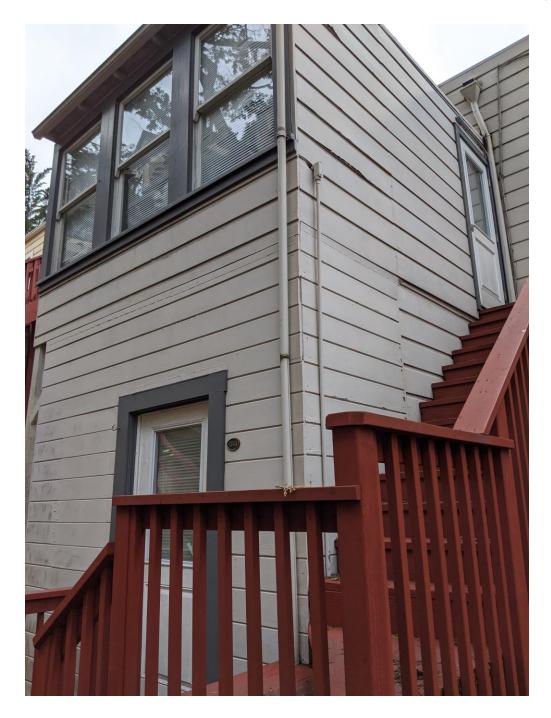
Rear Bedroom (Second Floor), Bathroom (First Floor), and Stair
